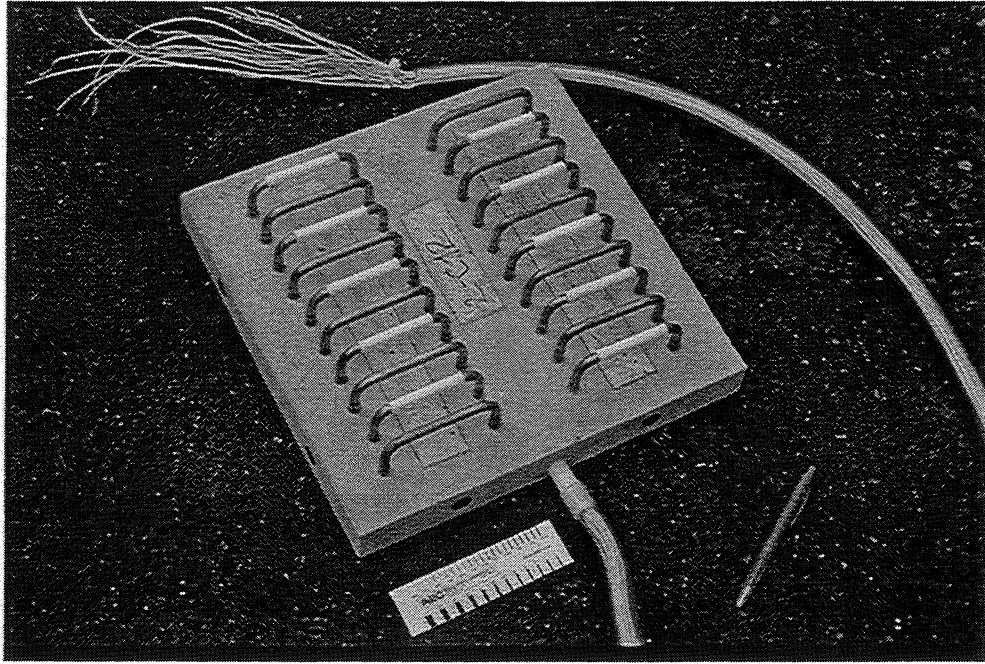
Steel electrodes with and without filter paper defects applied on the steel surface, mounted on a Densit mortar specimen holder prior to casting of test concrete.
